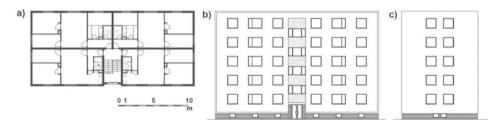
a) Typical floor plan; b) side façade; c) longitudinal facade of the selected multifamily housing building
